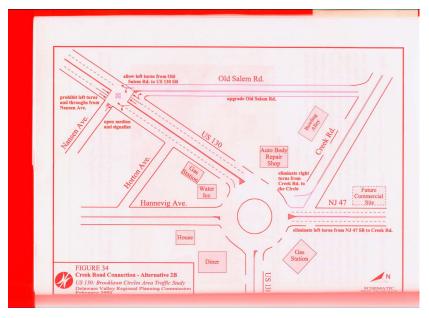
Alternative 2B – Creek road connection ⁽⁴⁾
